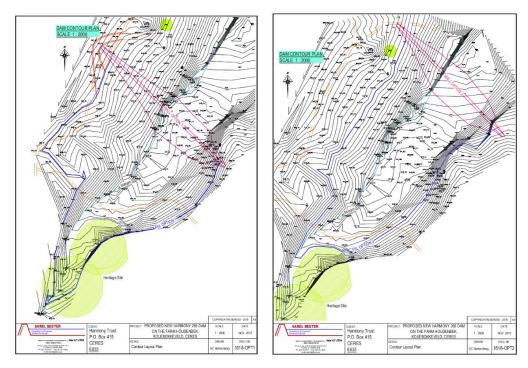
and b: Site Layout Plan indicating the proposed Options 1 and 2 $\,$
